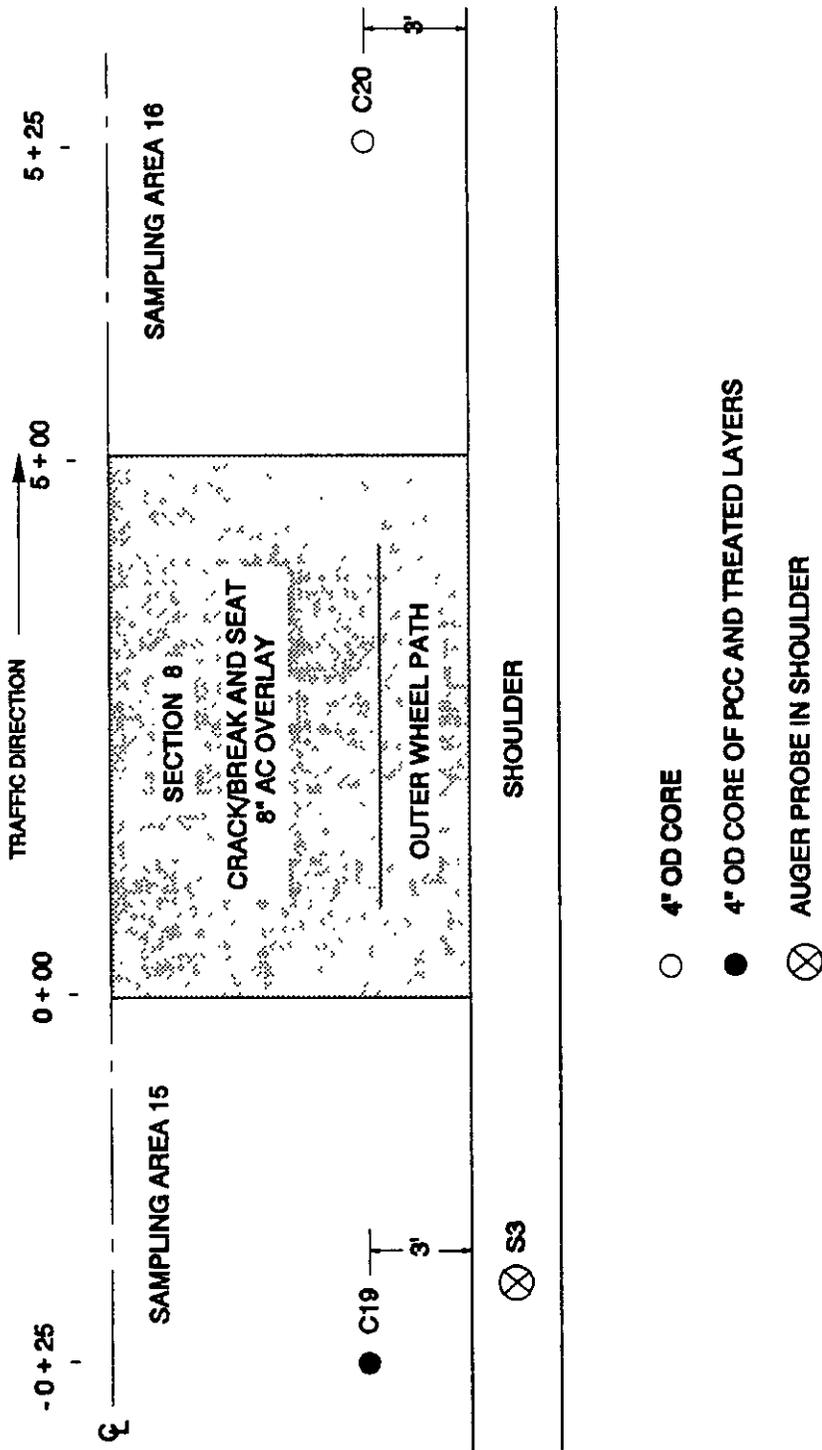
Example of "Pre-Construction" Sampling Plan for Test Section 8
